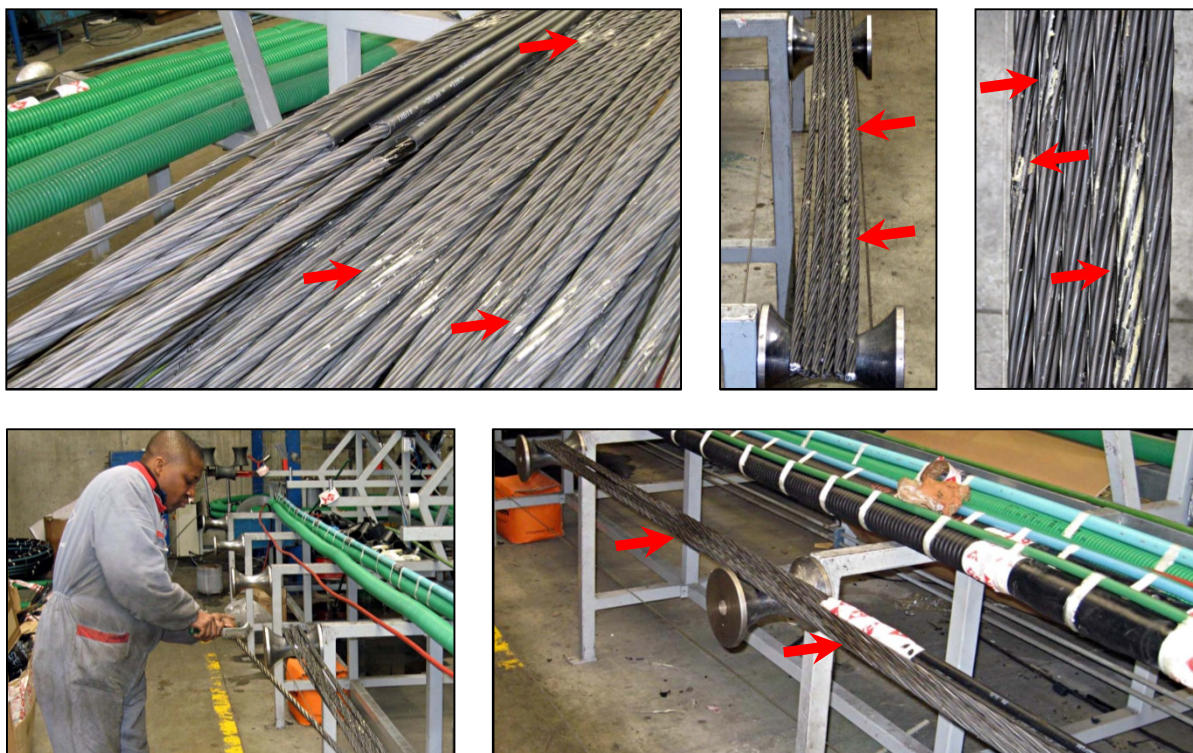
Production of a modified prestressed ground anchor of the type RCP/D-I: (a) formed lengths of anchor units, locally visible traces of vaseline on bare strands, (b) filling of packing connection of an anchor unit, (c) detail view of strand positioning in the upper part of bond length of an anchor unit.
